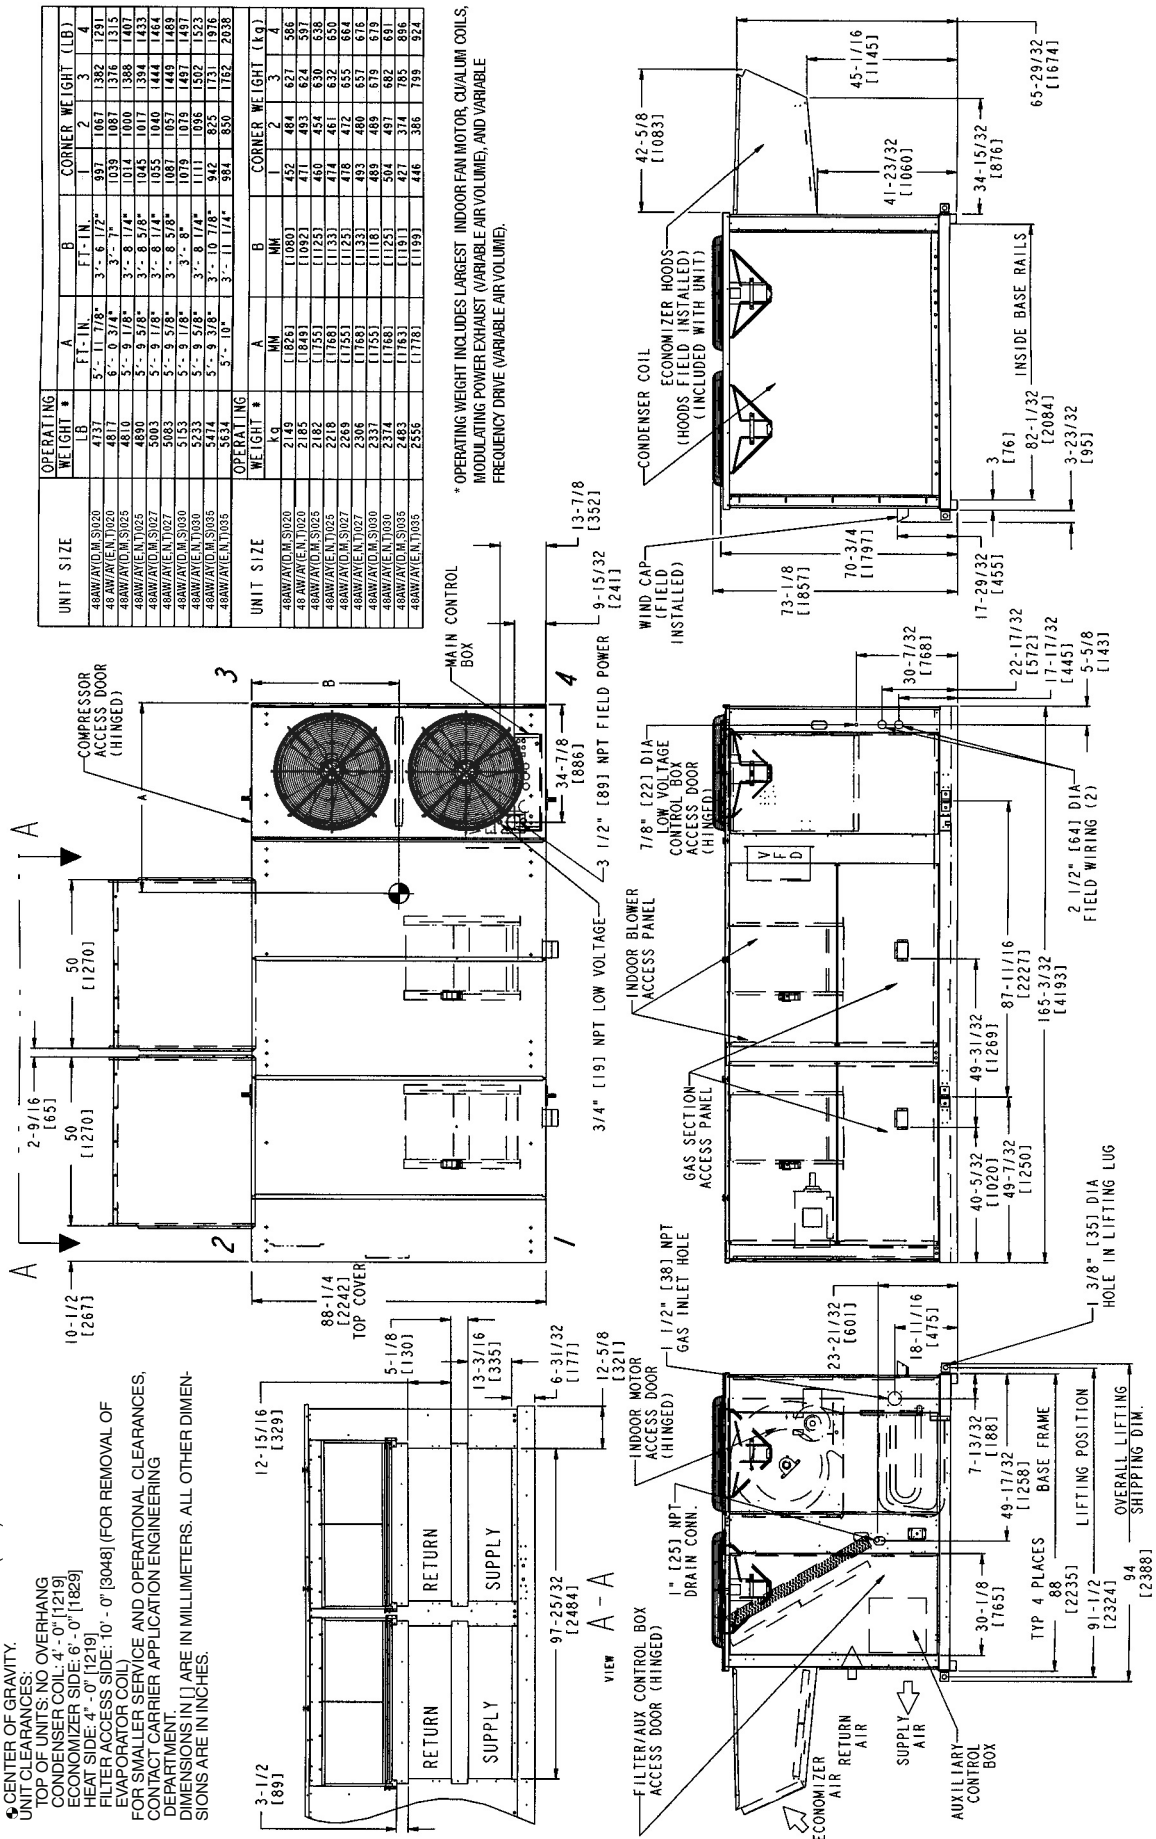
Base Unit Dimensions — 48AJ,AK051 and 060
